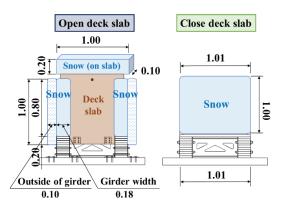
Model diagram of snow loads acting on openable deck timber bridge (dimensions: m)
